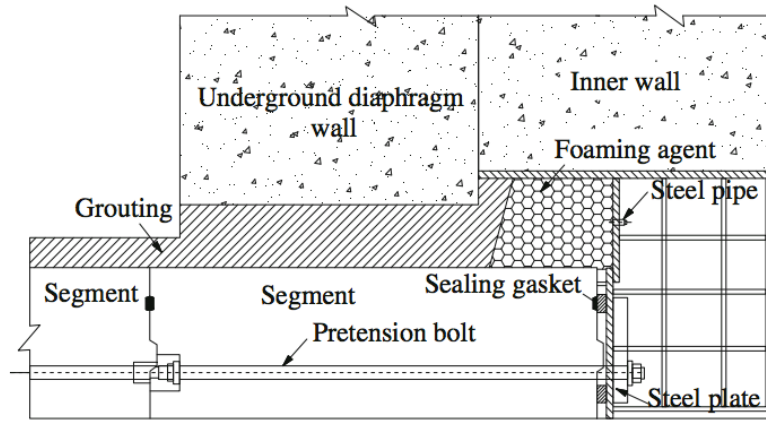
Station-tunnel connection of newer Shanghai tunnels (Wu et al., 2014)
